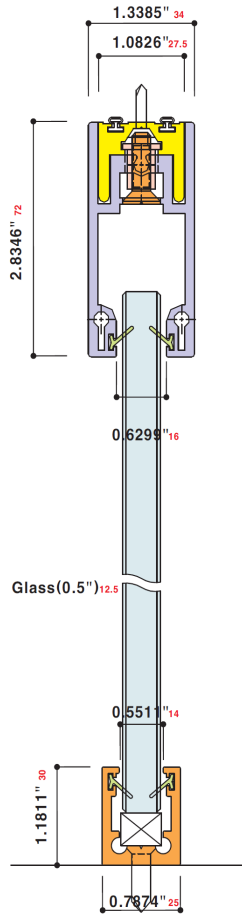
TYPICAL CROSS-SECTION OF GLAZED WALL PANEL
